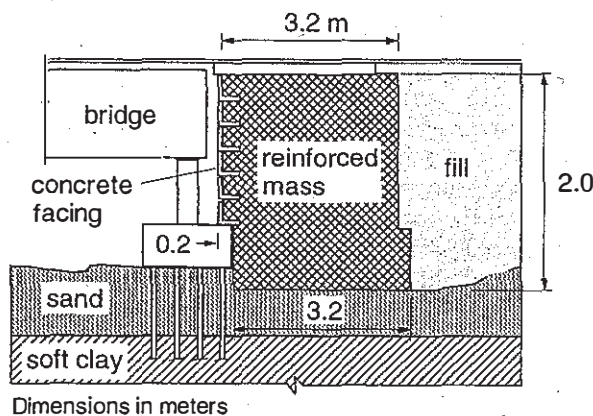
Sauipe River geotextile reinforced bridge abutment.
